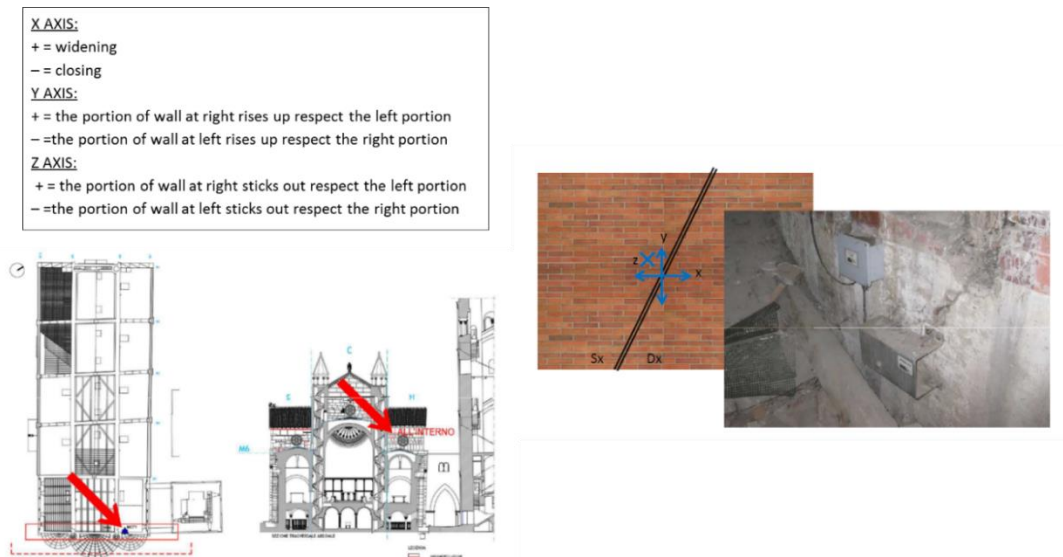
Triaxial joint meter installed in the longitudinal wall of the Cathedral (MGT1)
